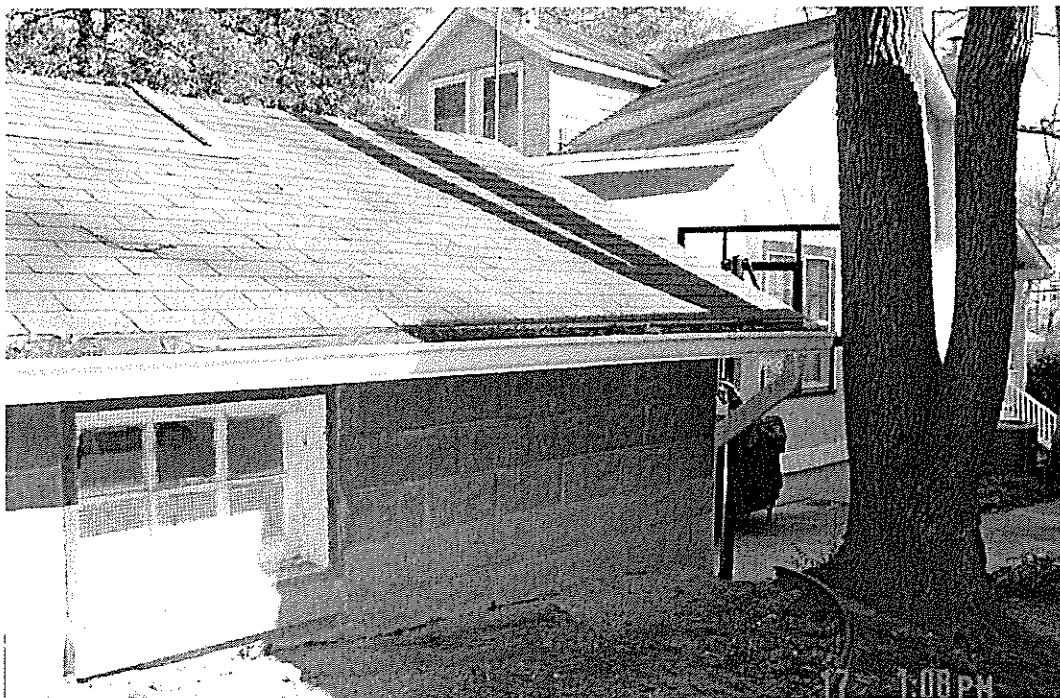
Willow Ave., Close-up of damage to garage block wall.
